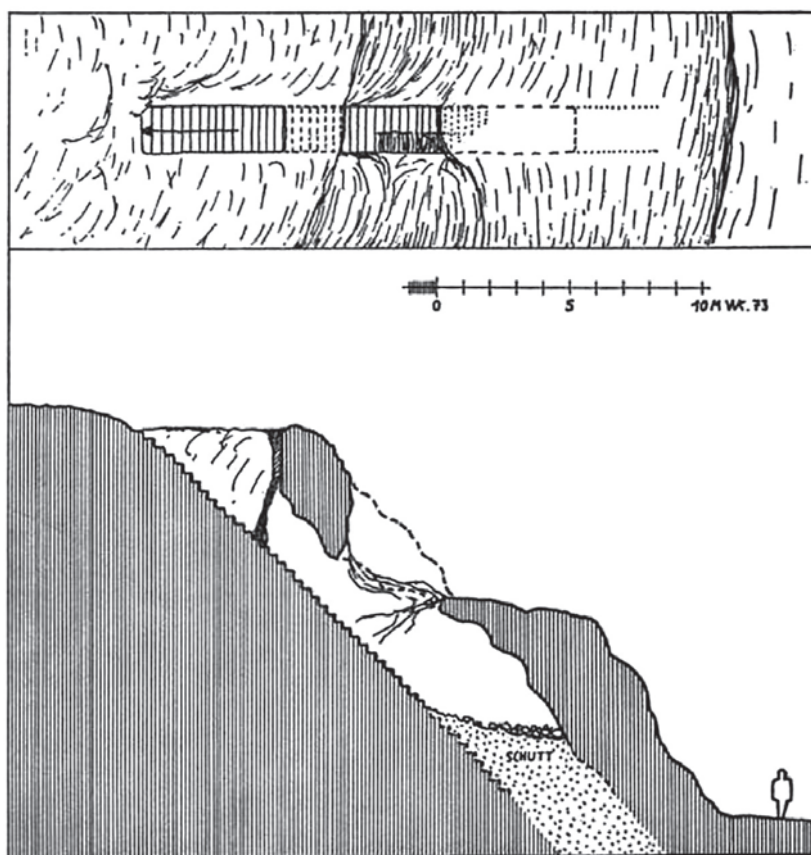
Plan and section of the rock-cut stepped tunnel (after Kleiss 1974: fig. 27).
